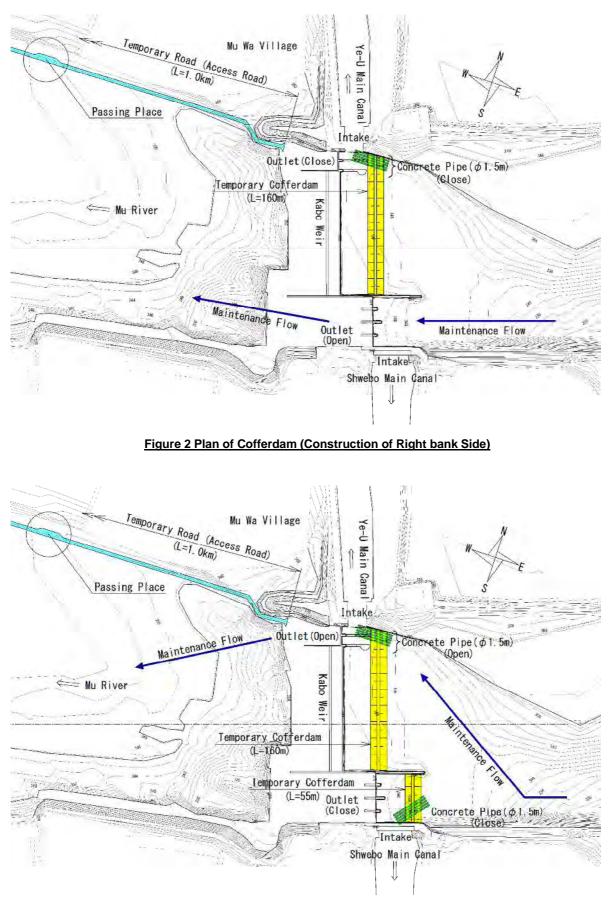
Plan of Cofferdam (Construction of Left bank Side)
